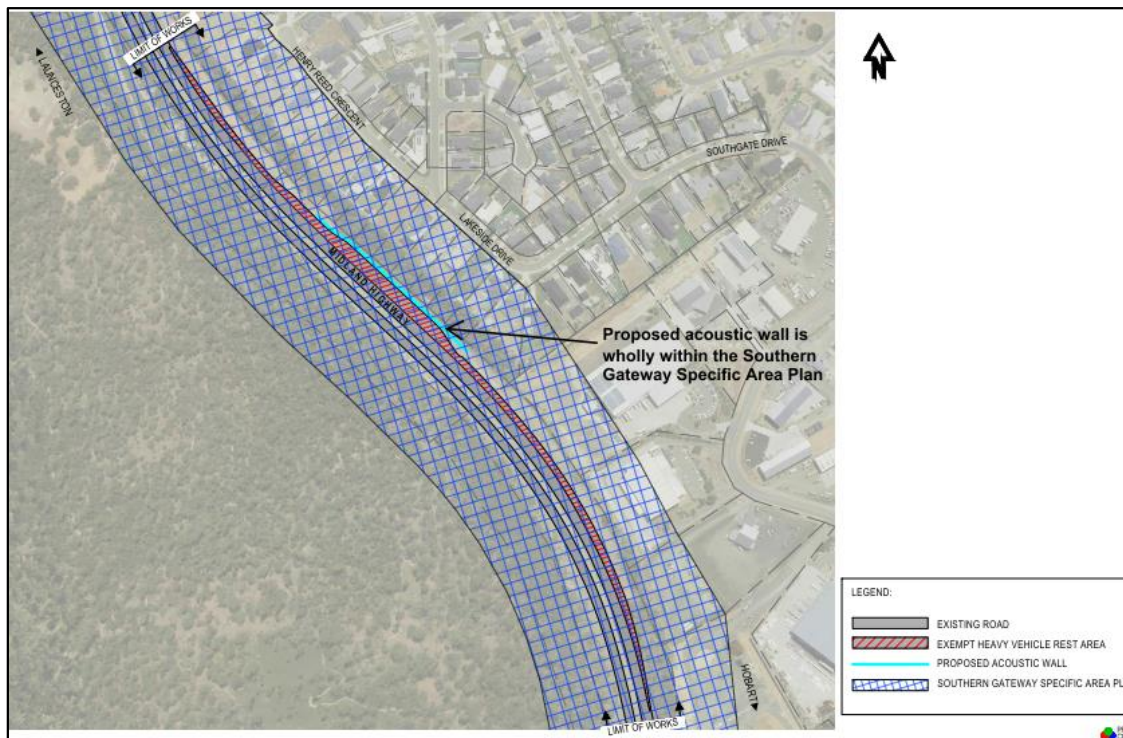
PROPOSED WALL IS IN THE SOUTHERN GATEWAY SAP OVERLAY
